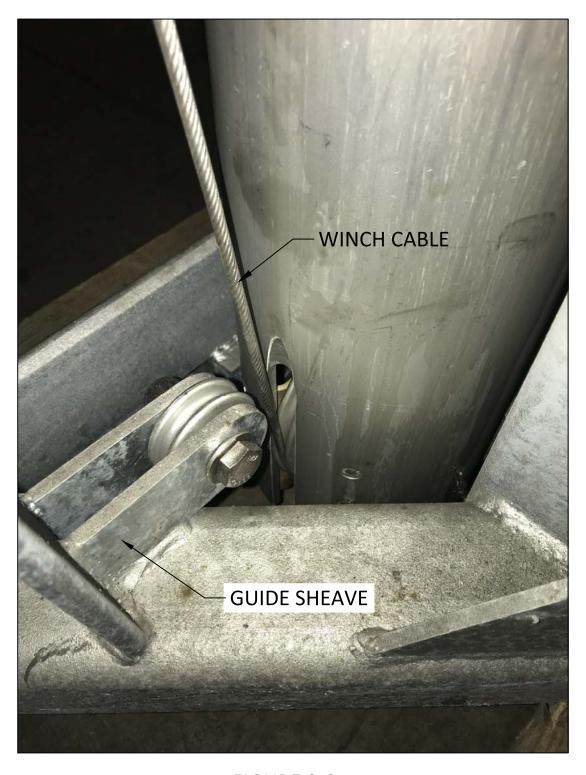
LOWERING MS-20 STRUCTURE - ENGAGING WINCH CABLE IN GUIDE SHEAVE (Ref. Section 3.4)
